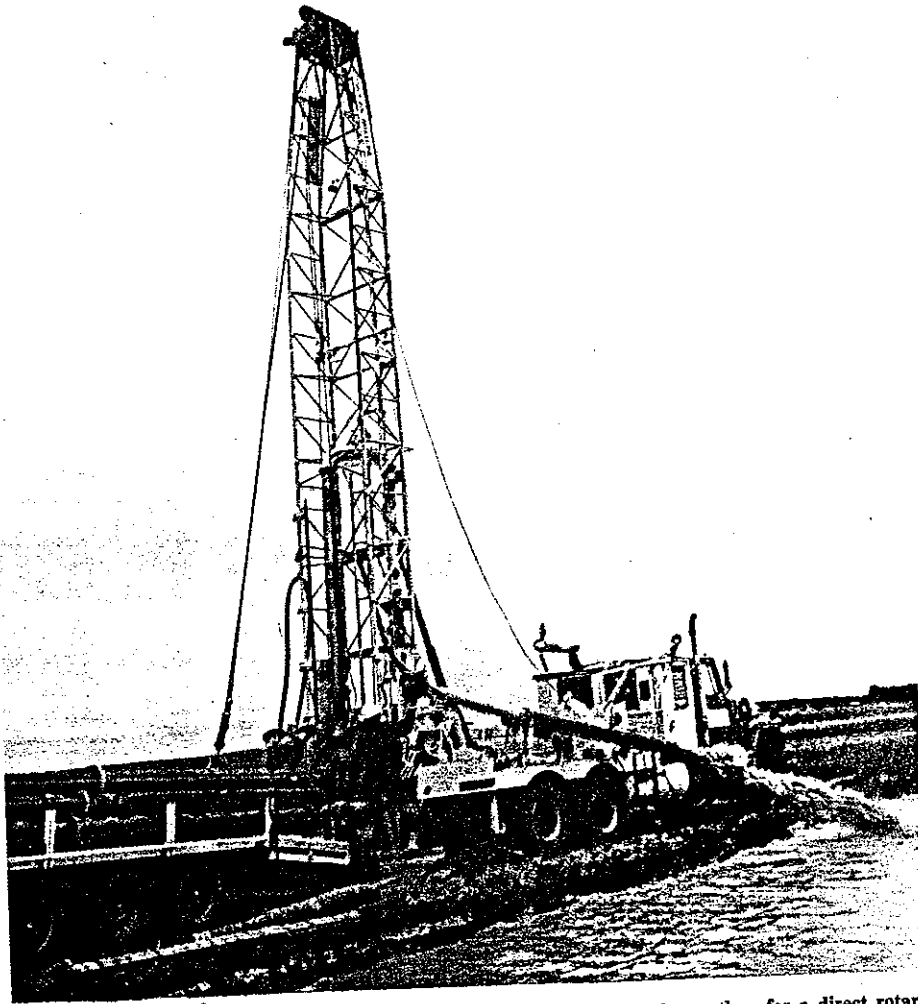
The settling pit for a reverse rotary rig is considerably larger than for a direct rotary machine because fluid losses in the borehole are always much higher. The pit should contain at least three times the volume of the material to be removed during drilling. (Portadrill, Inc.)
